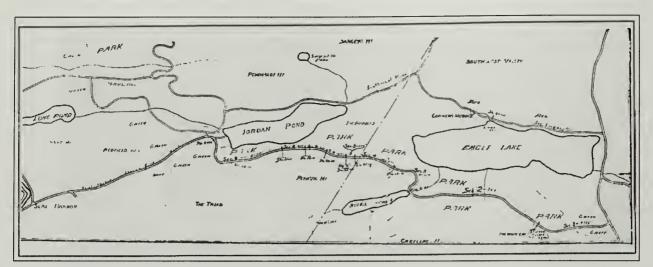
Proposed construction sections of the Jordan Pond/Eagle Lake Road, circa 1927. (Acadia National Park archives)
